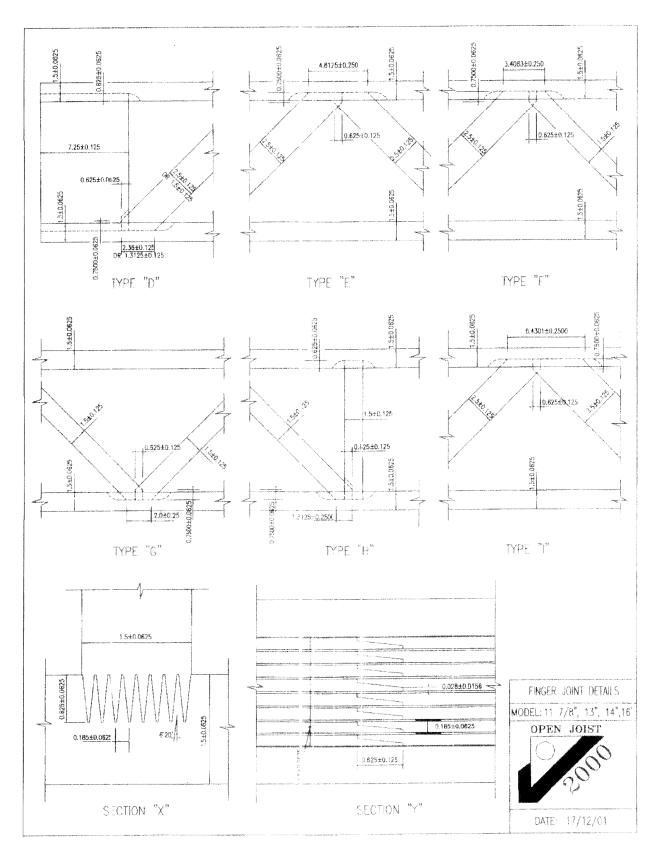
TYPICAL TRUSS DETAILS (Continued)
